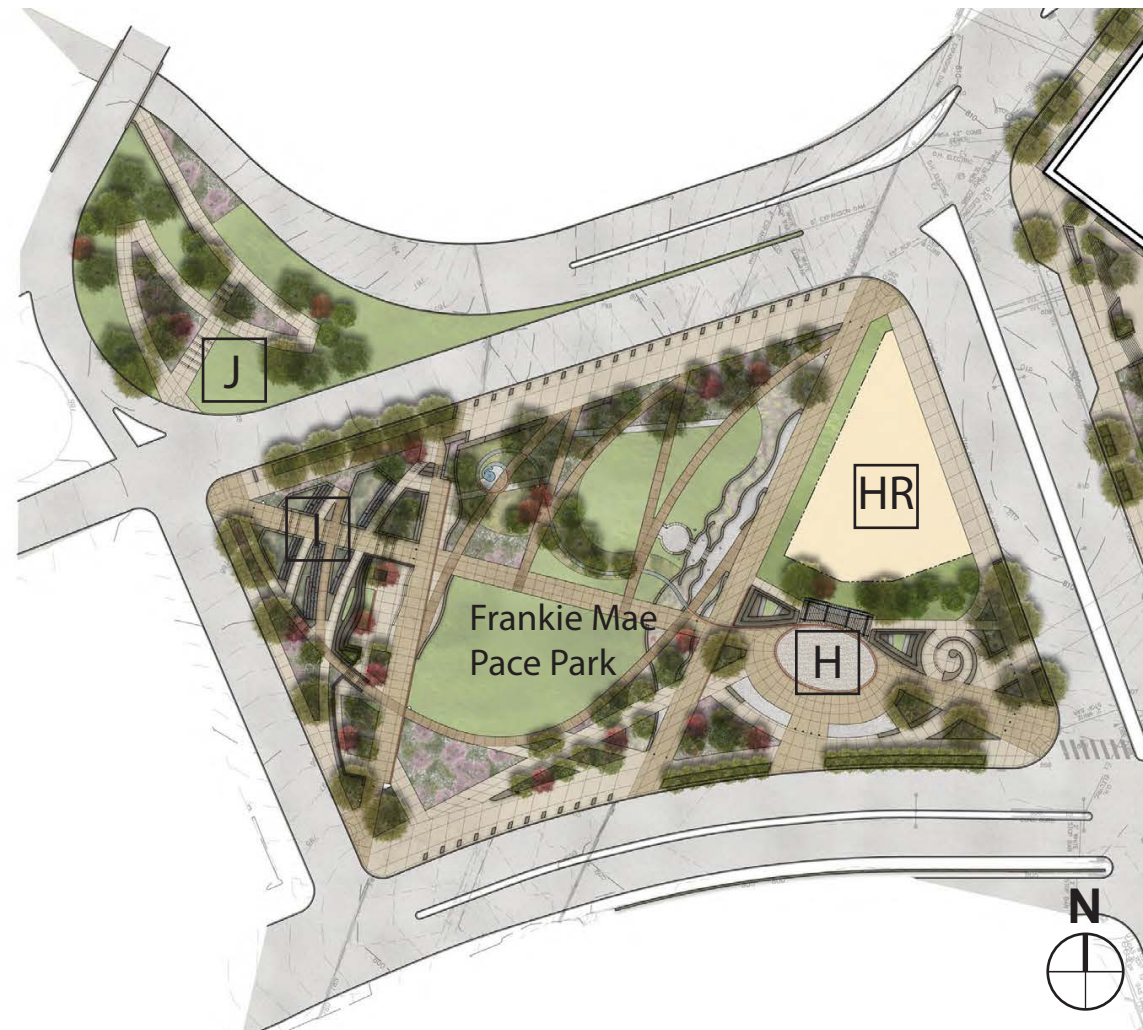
Enlarged illustrative plan showing a small adjacent pavilion /restaurant with an outdoor dining terrace, pylon marking the entry plaza, and a tree-lined promenade.
